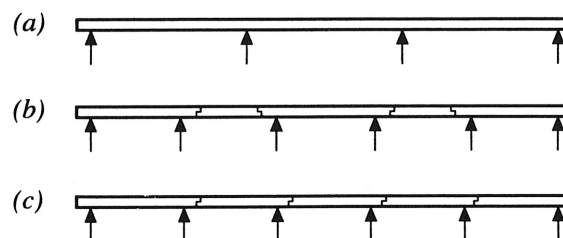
(a) Continuous beam. (b) and (c) Cantilever beams. For cantilevered beams the joint pattern shown in (b) should be chosen. For the pattern (c) there is an unnecessary risk of progressive collapse.
